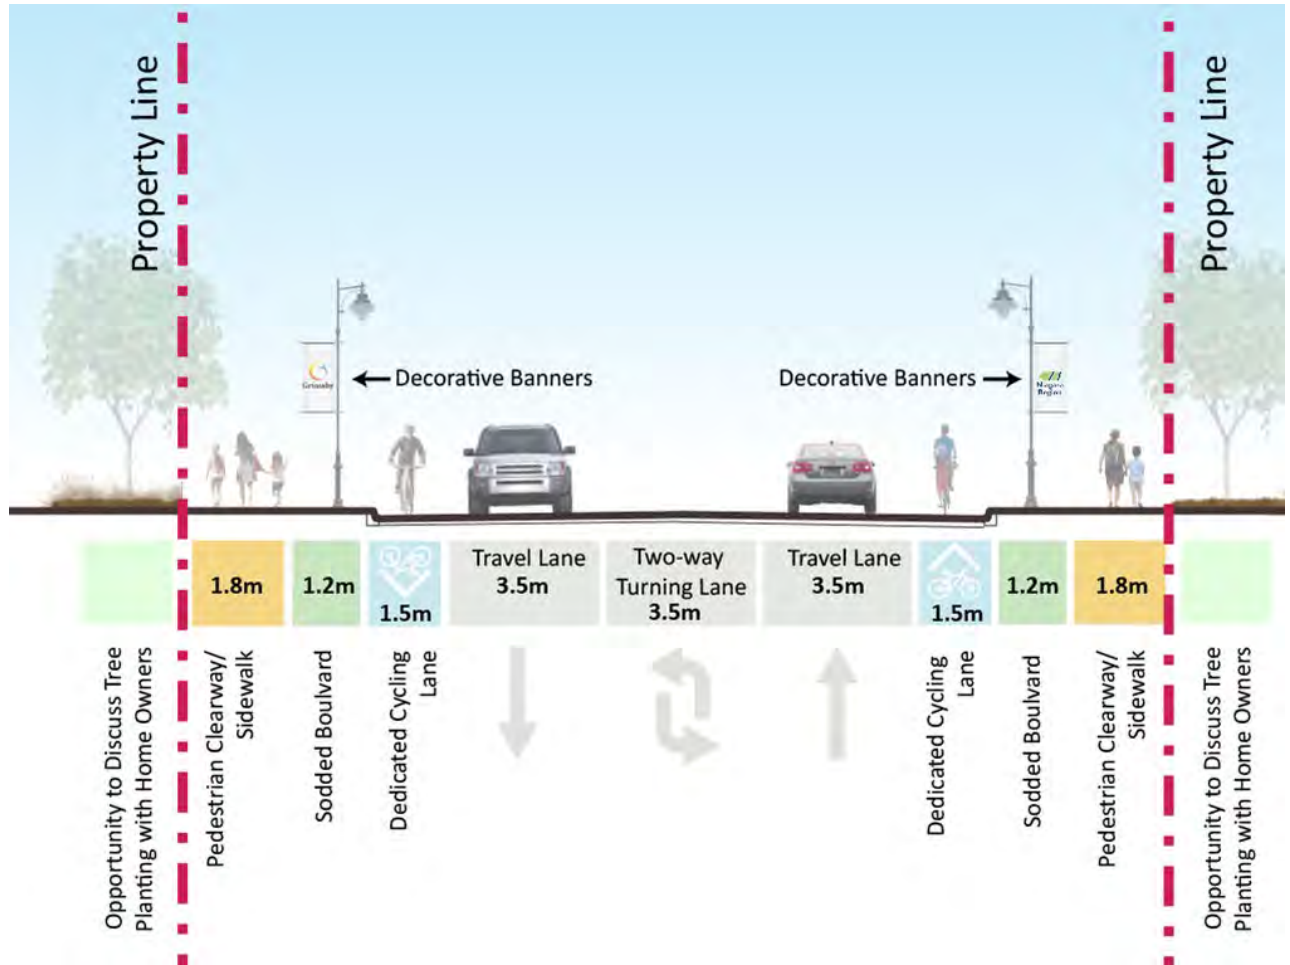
Proposed Livingston Avenue Road Cross Section from Casablanca Boulevard to West of Emily Street
